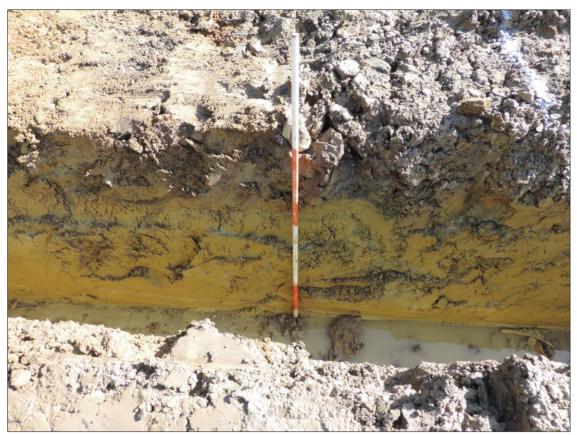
Southeast facing view of foundation trench with made ground sealing truncated natural. Scale 1 x 2 m.
